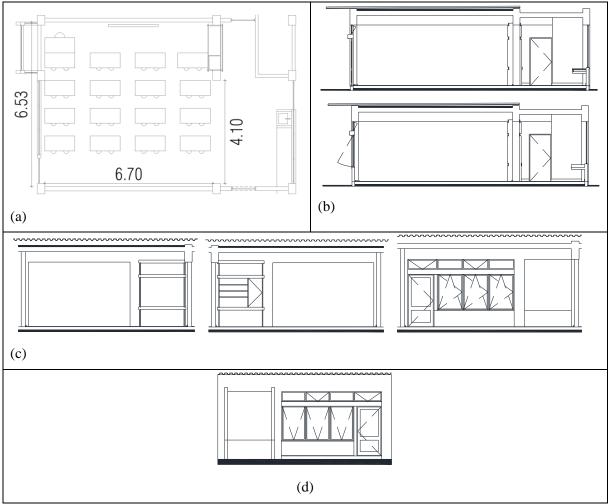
Classroom drawings: (a) plan view; (b) longitudinal cross-sections; (c) transverse cross-sections; (d) vertical plans.
